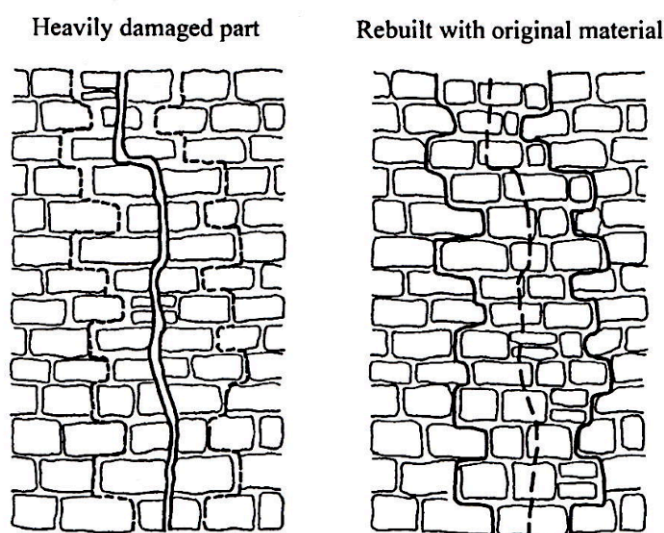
Reconstruction of the central part of a heavily cracked stone-masonry wall [21]
